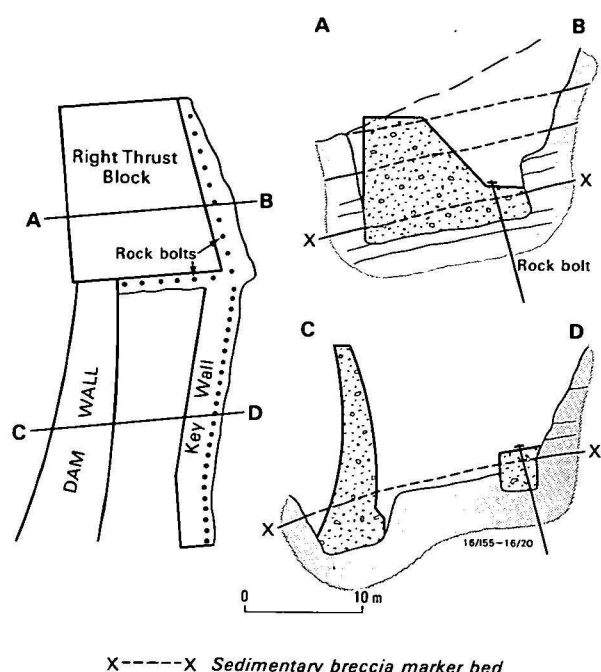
Treatment to stabilise potential slip plane in right thrust block excavation, Bendora Dam.
